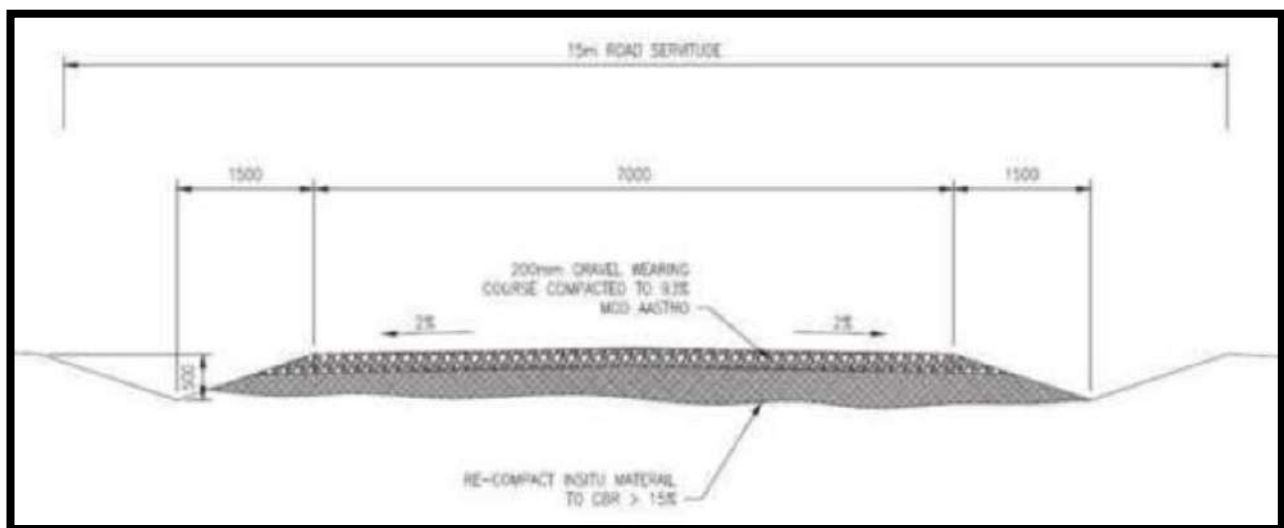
Cross sectional diagram of the proposed access road to be established across the Grootfontein subject site. (source; 'Access Road description and construction method – Grootfontein PV 1, 2 and 3' (Dated 11/02/2022)).
